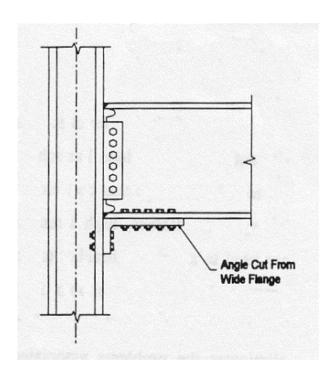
Bolted Bracket Connection, Angle Type
